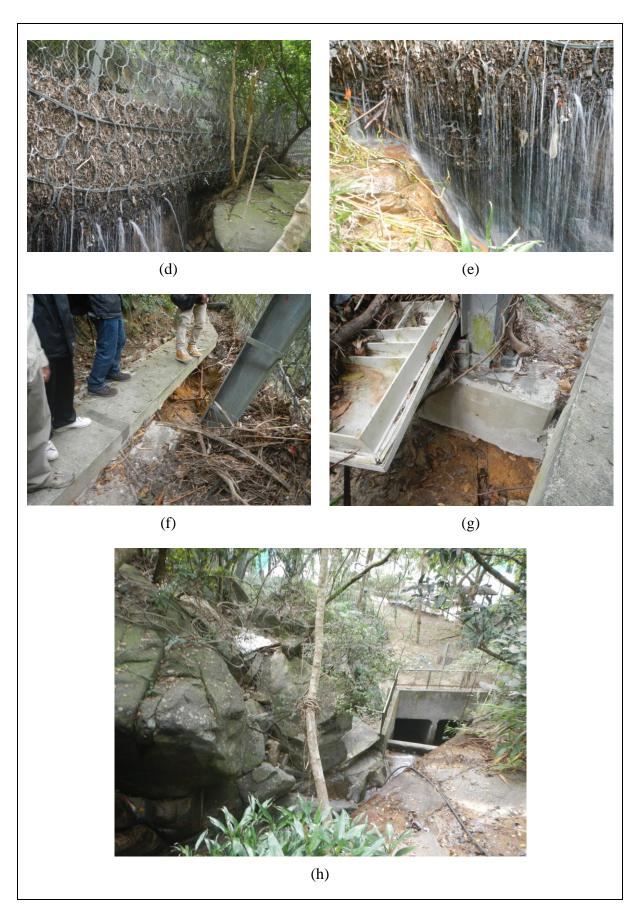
Site Inspection Photos (Sheet 2 of 2)
